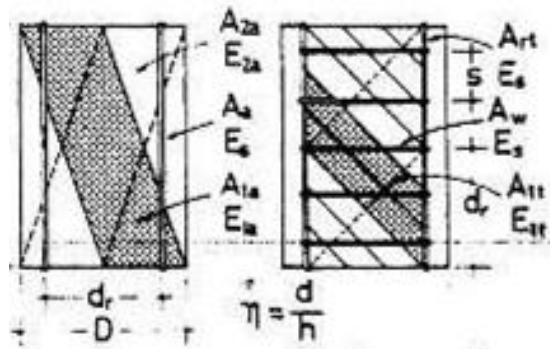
Arch-beam (left) and Truss (right) mechanism of reinforced masonry wall failing in shear (from Wakabayashi and Nakamura, 1984).
